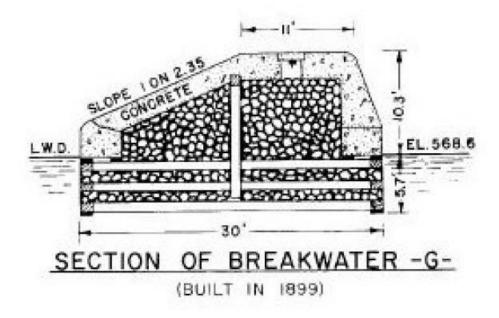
Cross section of existing breakwater showing concrete monolith cap.
